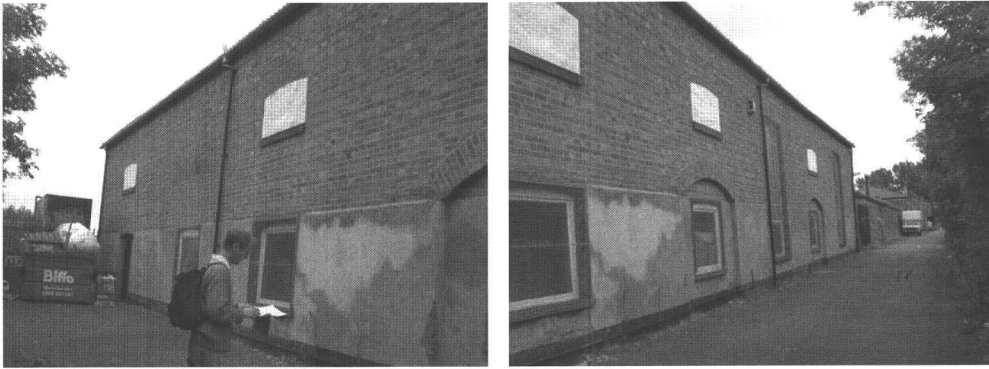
Coke Store south elevation — views looking west (left) and east (right).
